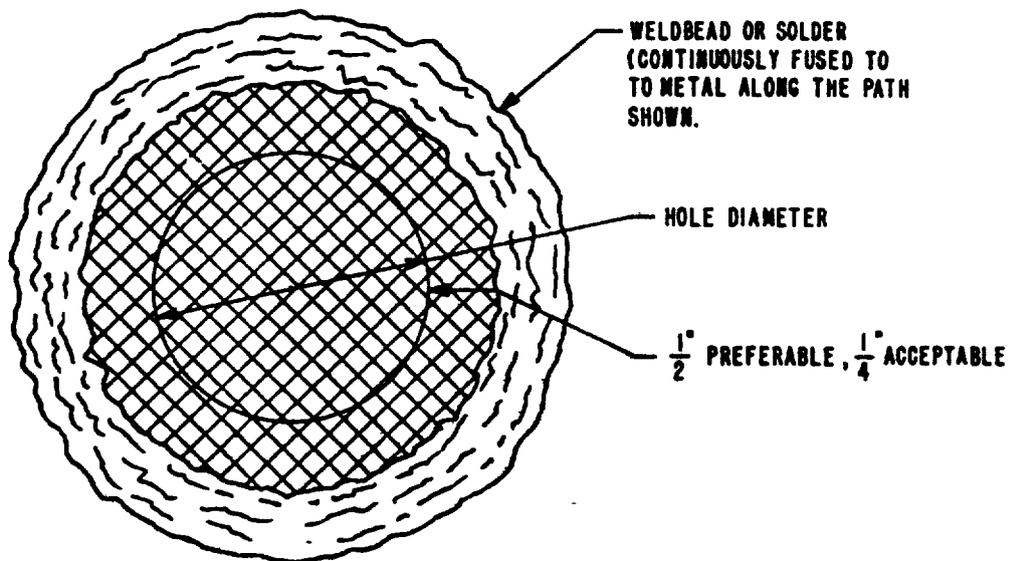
TYPICAL WELDED SCREEN INSTALLATION OVER A VENTILATION APERTURE
